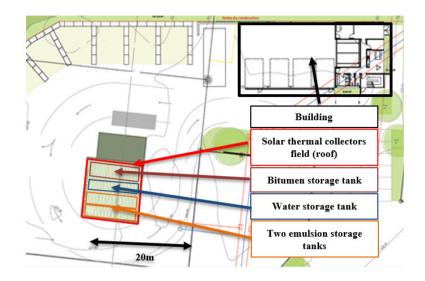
Yverdon-les-Bains site plan with the solar field location
